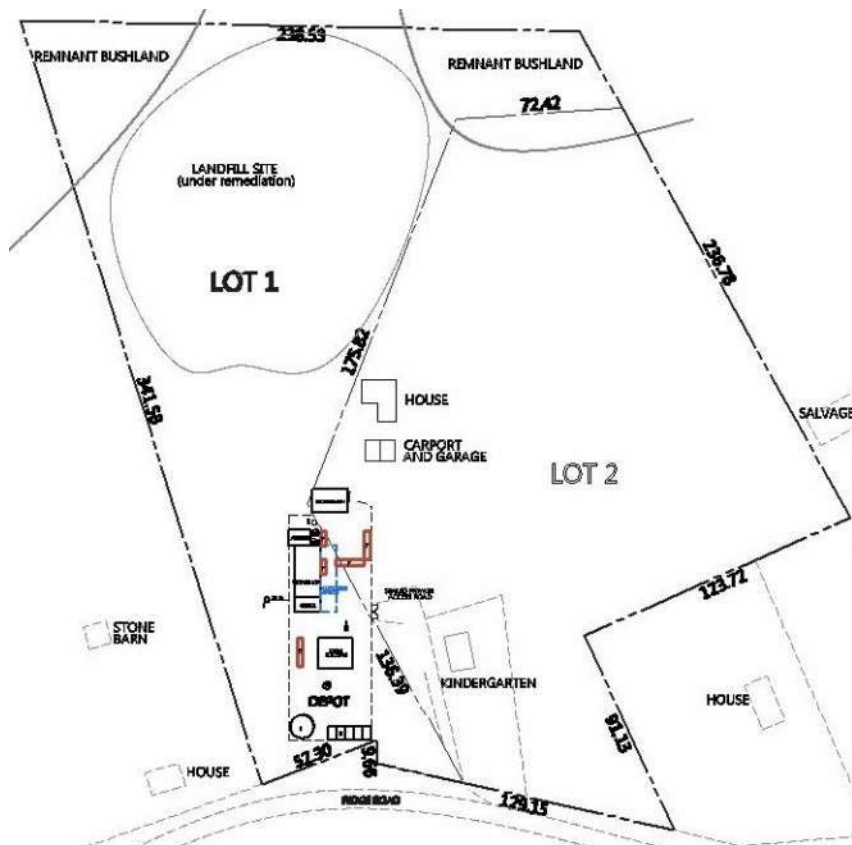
Plan of 177 Ridge Road Ashton; also refer Attachment 1.
